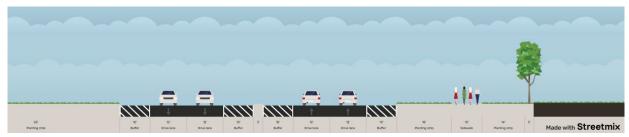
IL-116 Looking SW near Far Hills Dr (proposed approximate cross-section)
